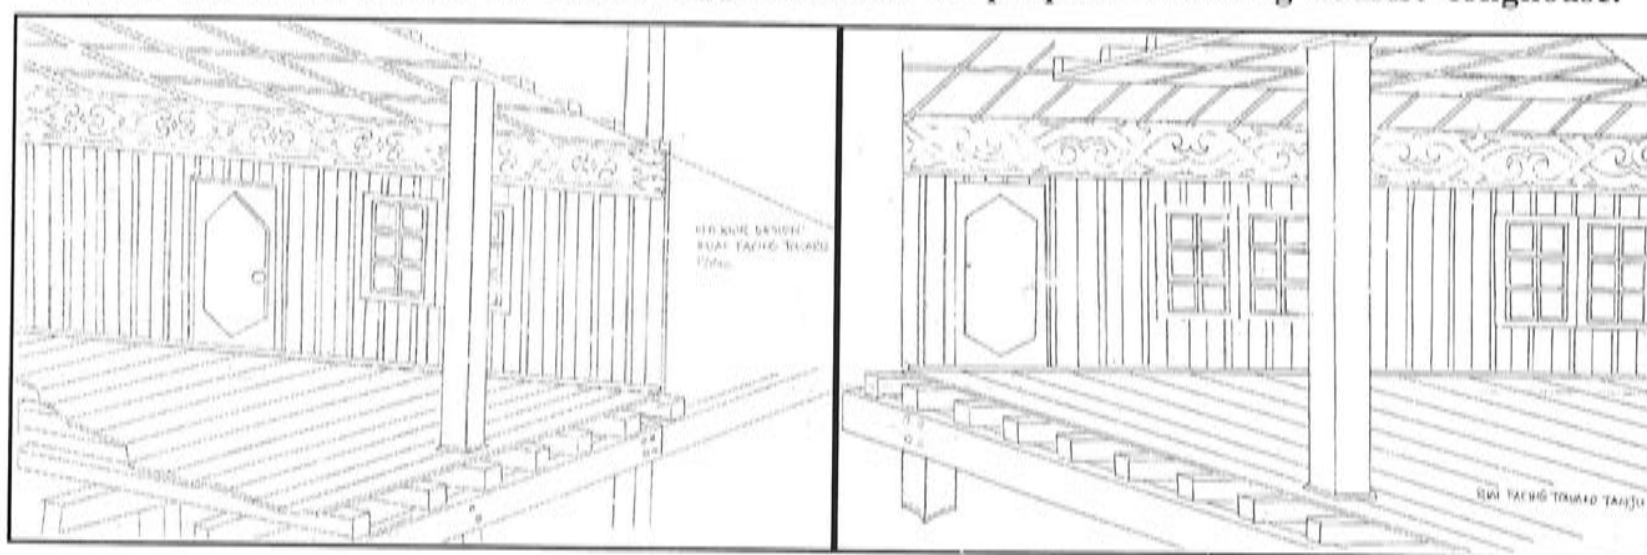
Sketch-plan of proposed Stamang 'tourist' longhouse. Left, interior facing *bilik*. Right, interior facing *tanju* (previous page).
